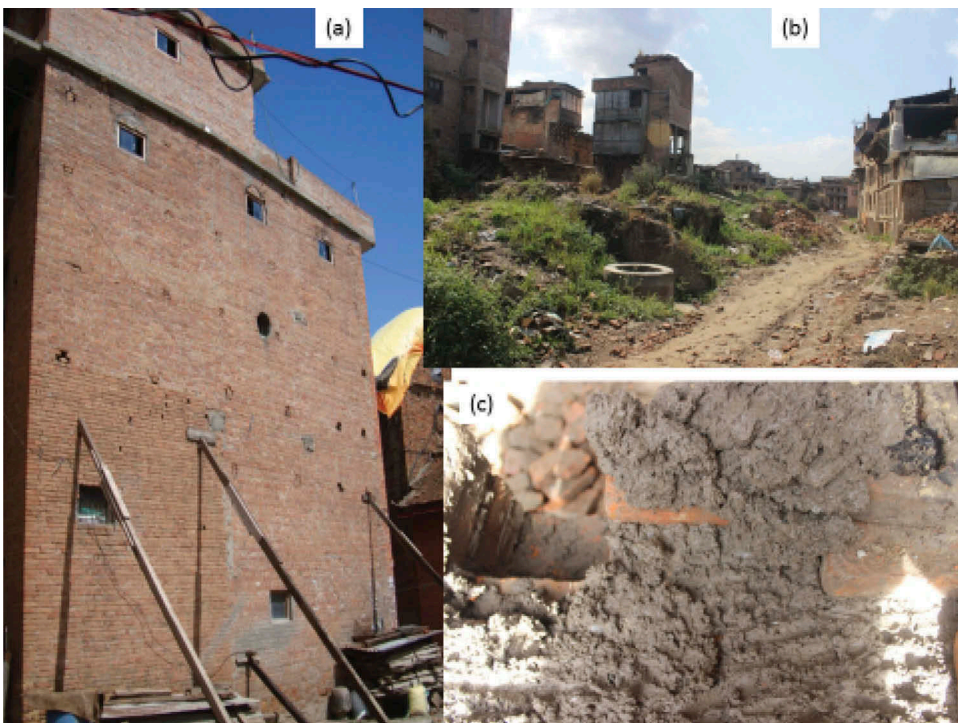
(a) RC slab constructed in the existing brick masonry building which underwent incremental construction after the Gorkha earthquake (b) destroyed neighborhood in Jela ridgeline (c) mud mortar used for reconstruction after the earthquake.
